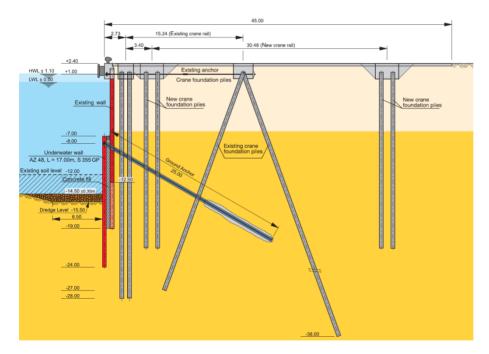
Extra wall with additional anchor, Kaohsiung, Taiwan
